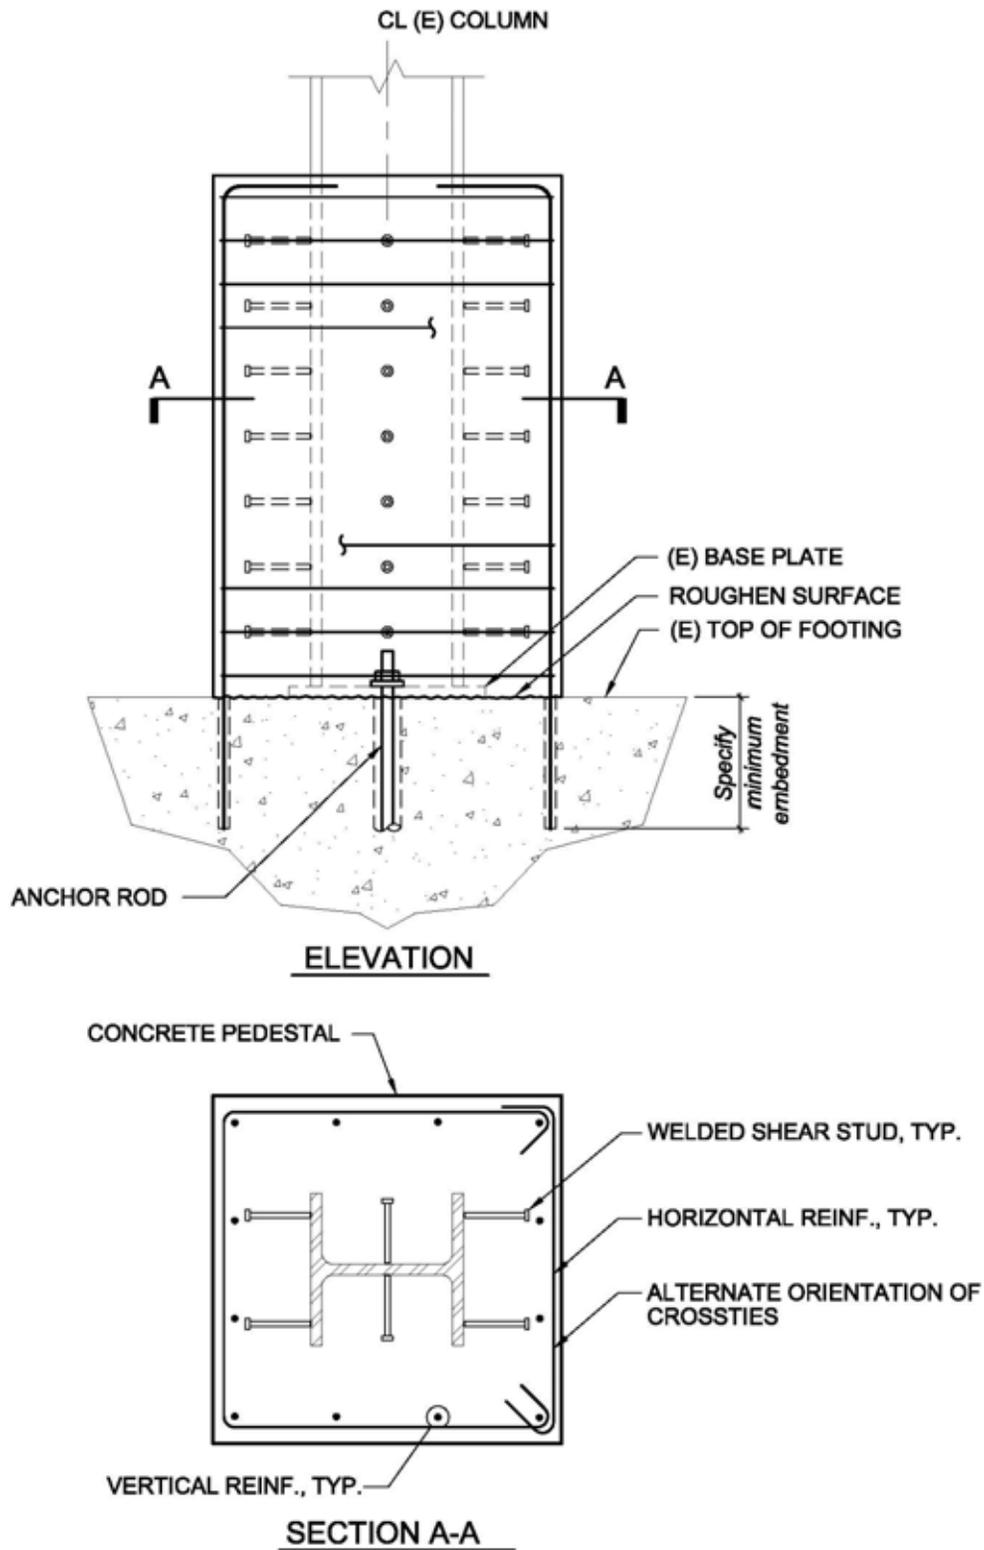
Concrete Pedestal at Existing Column
